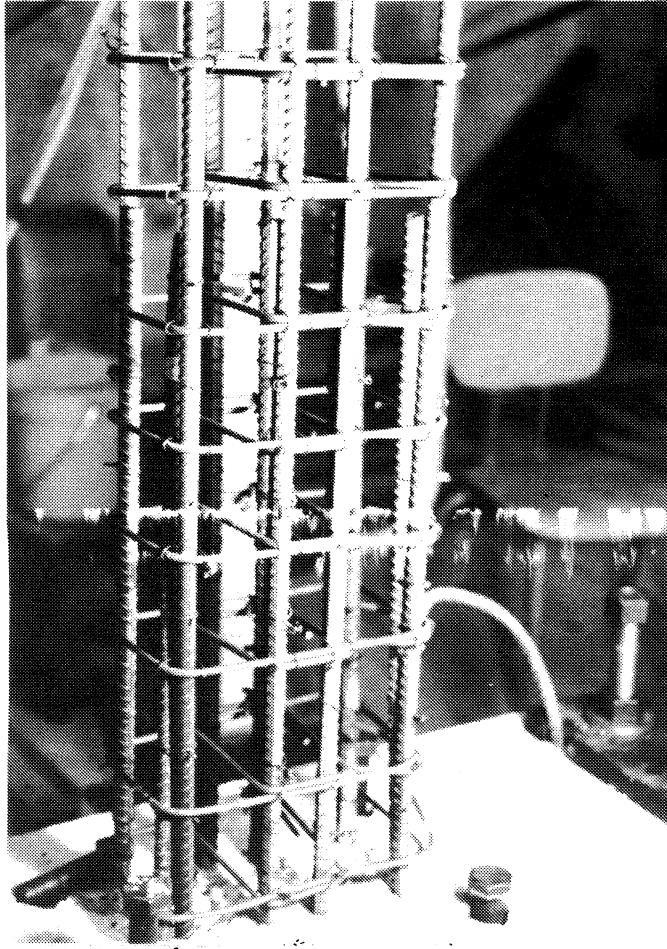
Lap Splice of The Column Bars at The Foundation
